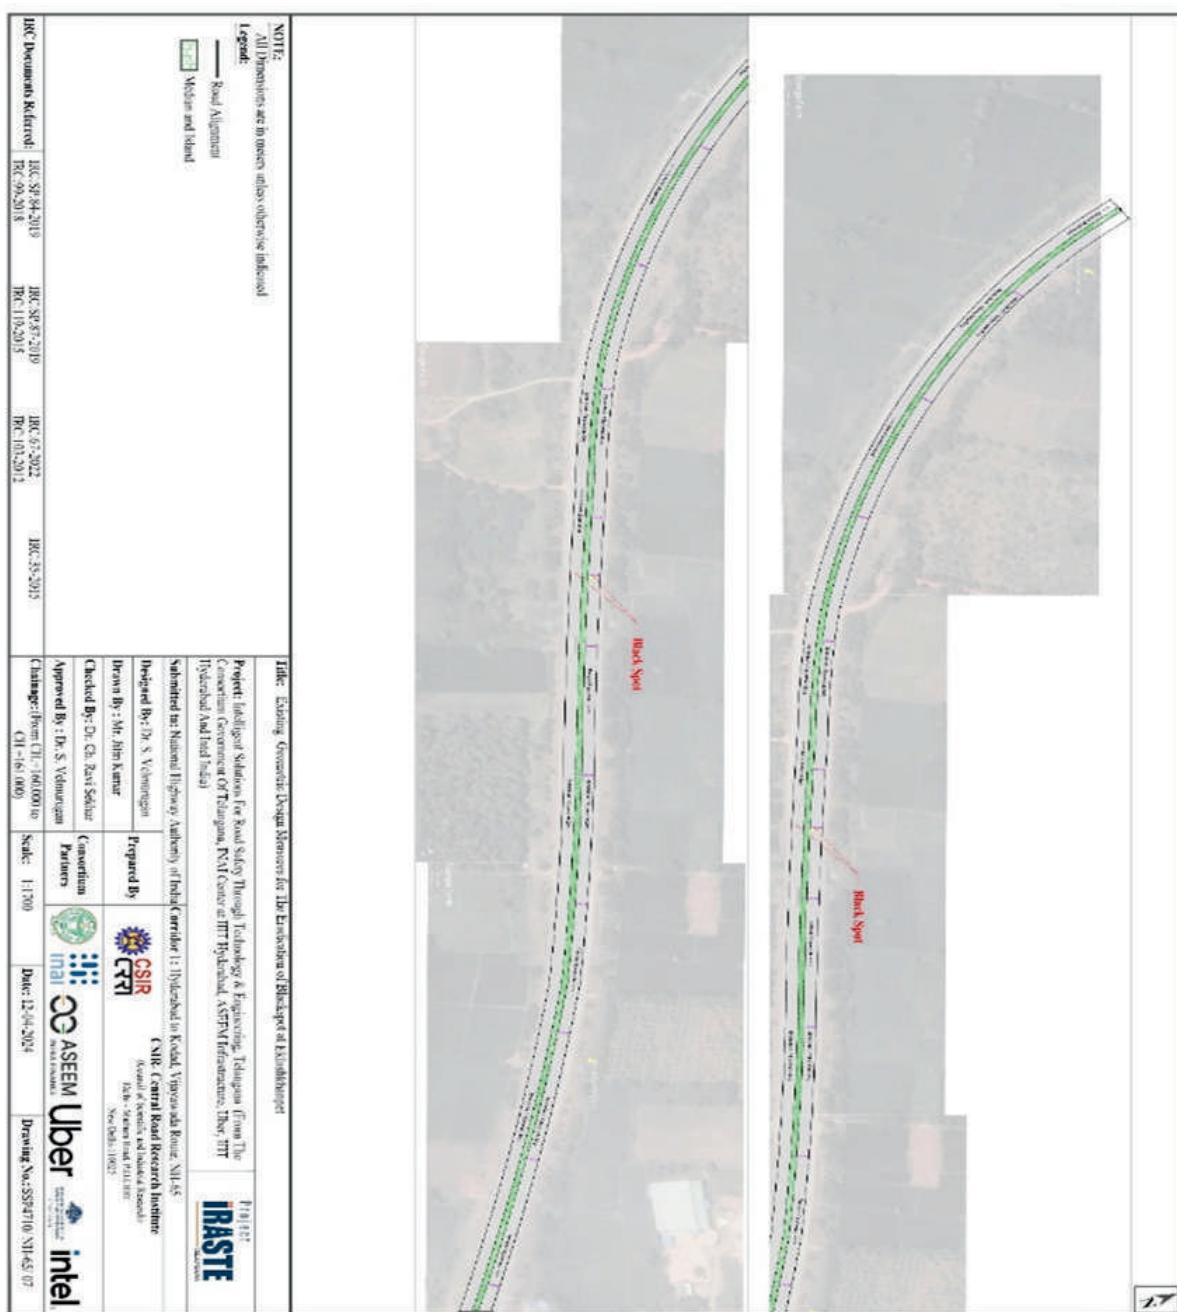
Existing Physical Survey Plan of Eklashkhanpet Section of NH-65
